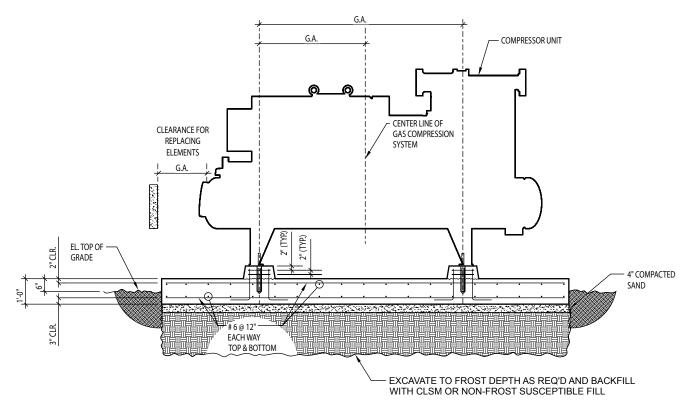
Concrete Pad with Compressor Unit Dimensions - Side View
